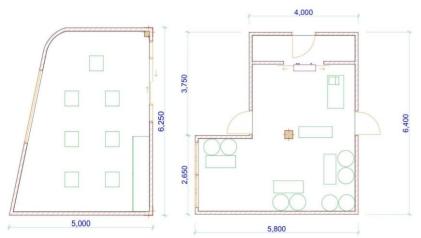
(left). Petsaga Floor Plan Figure 2 (right). D'Meow Floor Plan
